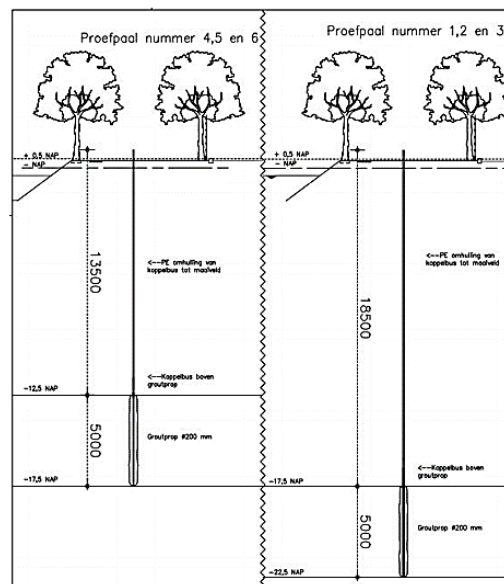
CROSS SECTION OF THE FAILURE TEST AT SITE
